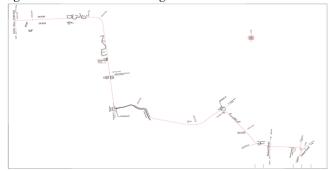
Route Alignment with significant location detail from Airport Road to Mirpur Cantonment Road.
